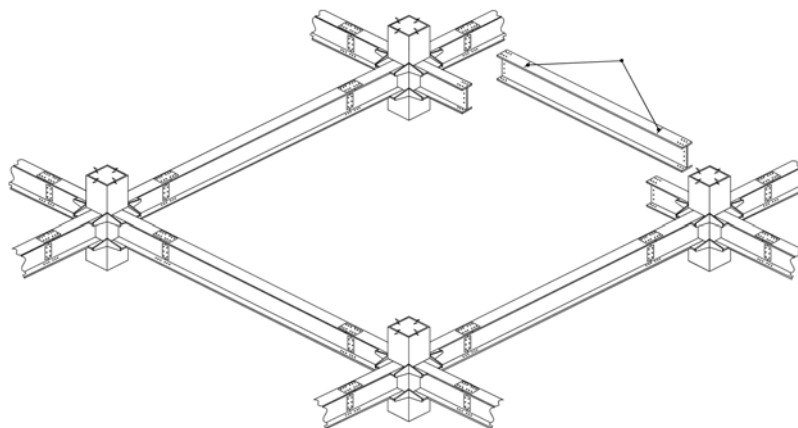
Construction and setup of T-stiffener connection at a construction site.
